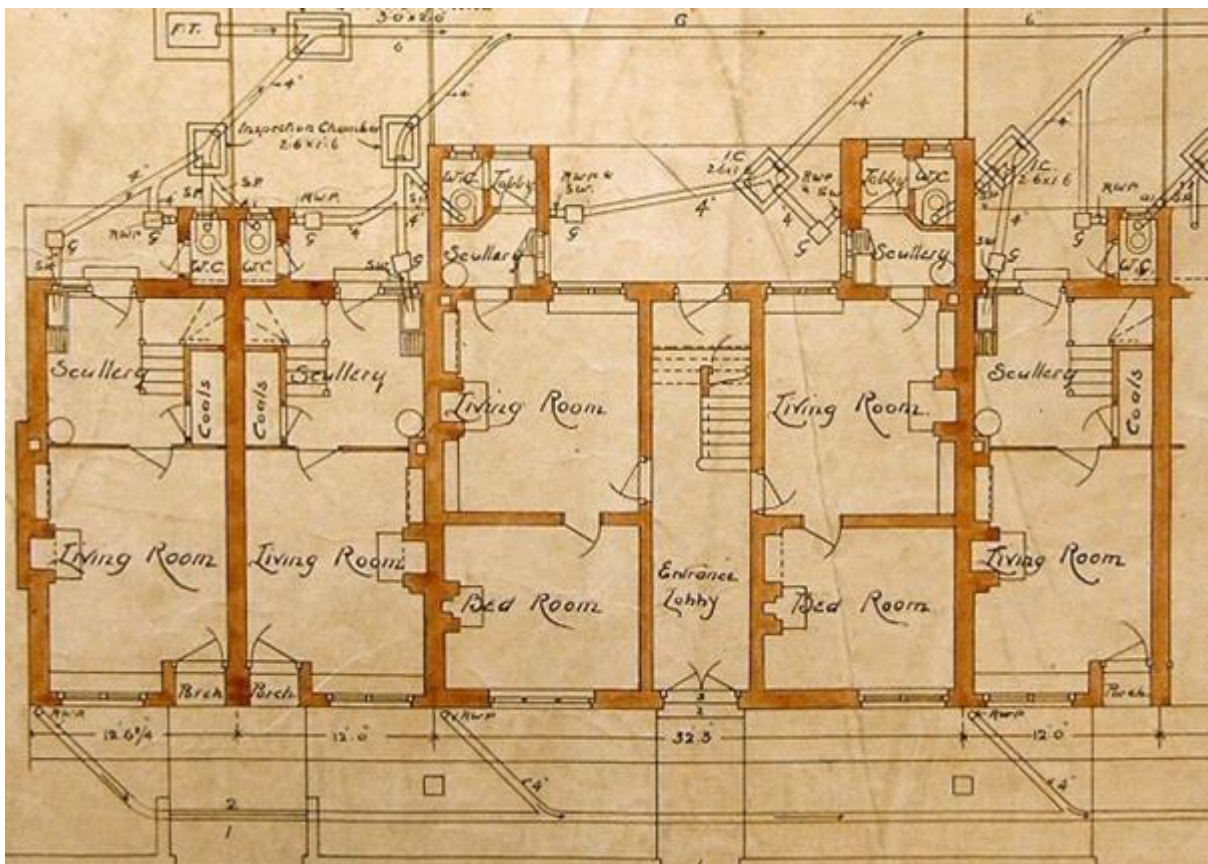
Collerston Cottages, floor plan (LMA ref: LCC/AR/HS/03/002)
